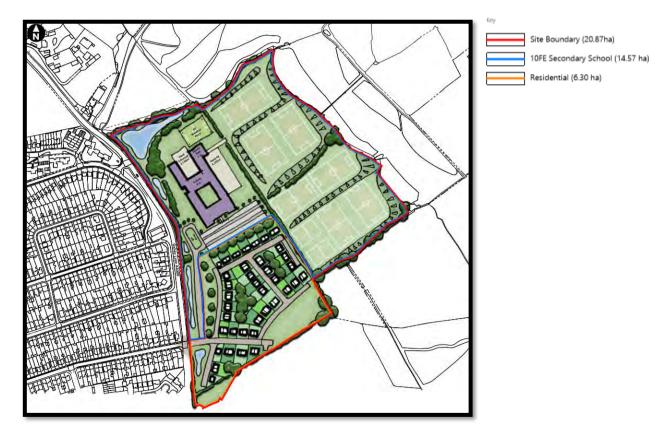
Concept Masterplan Plan – Option 1 (three-storey school)
